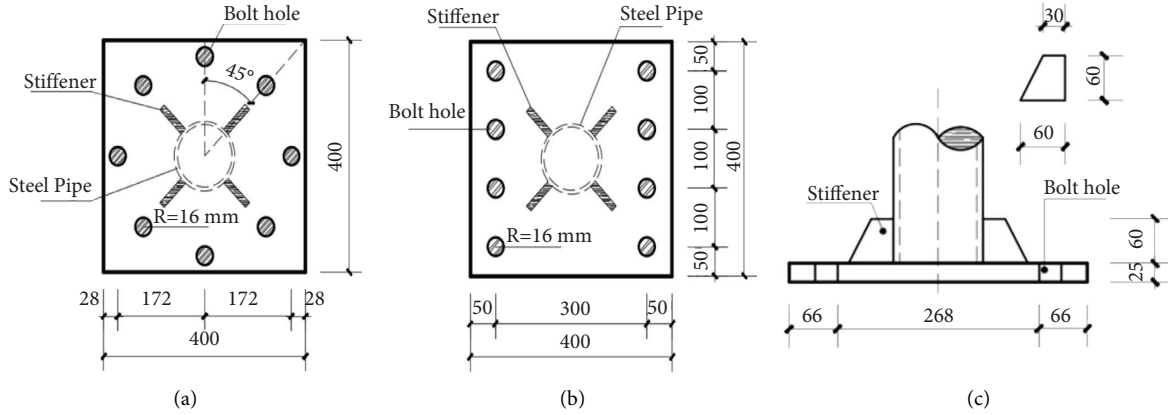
Sizes of specimens (unit: mm): (a) upper end plate, (b) lower end plate, and (c) stiffener.
